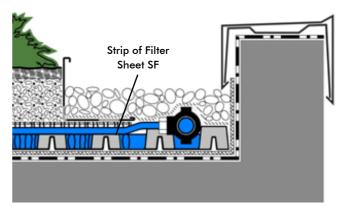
Roof edge with gravel strip and Eaves Profile DP 120; Dripperlines installed paralelly to roof edge
